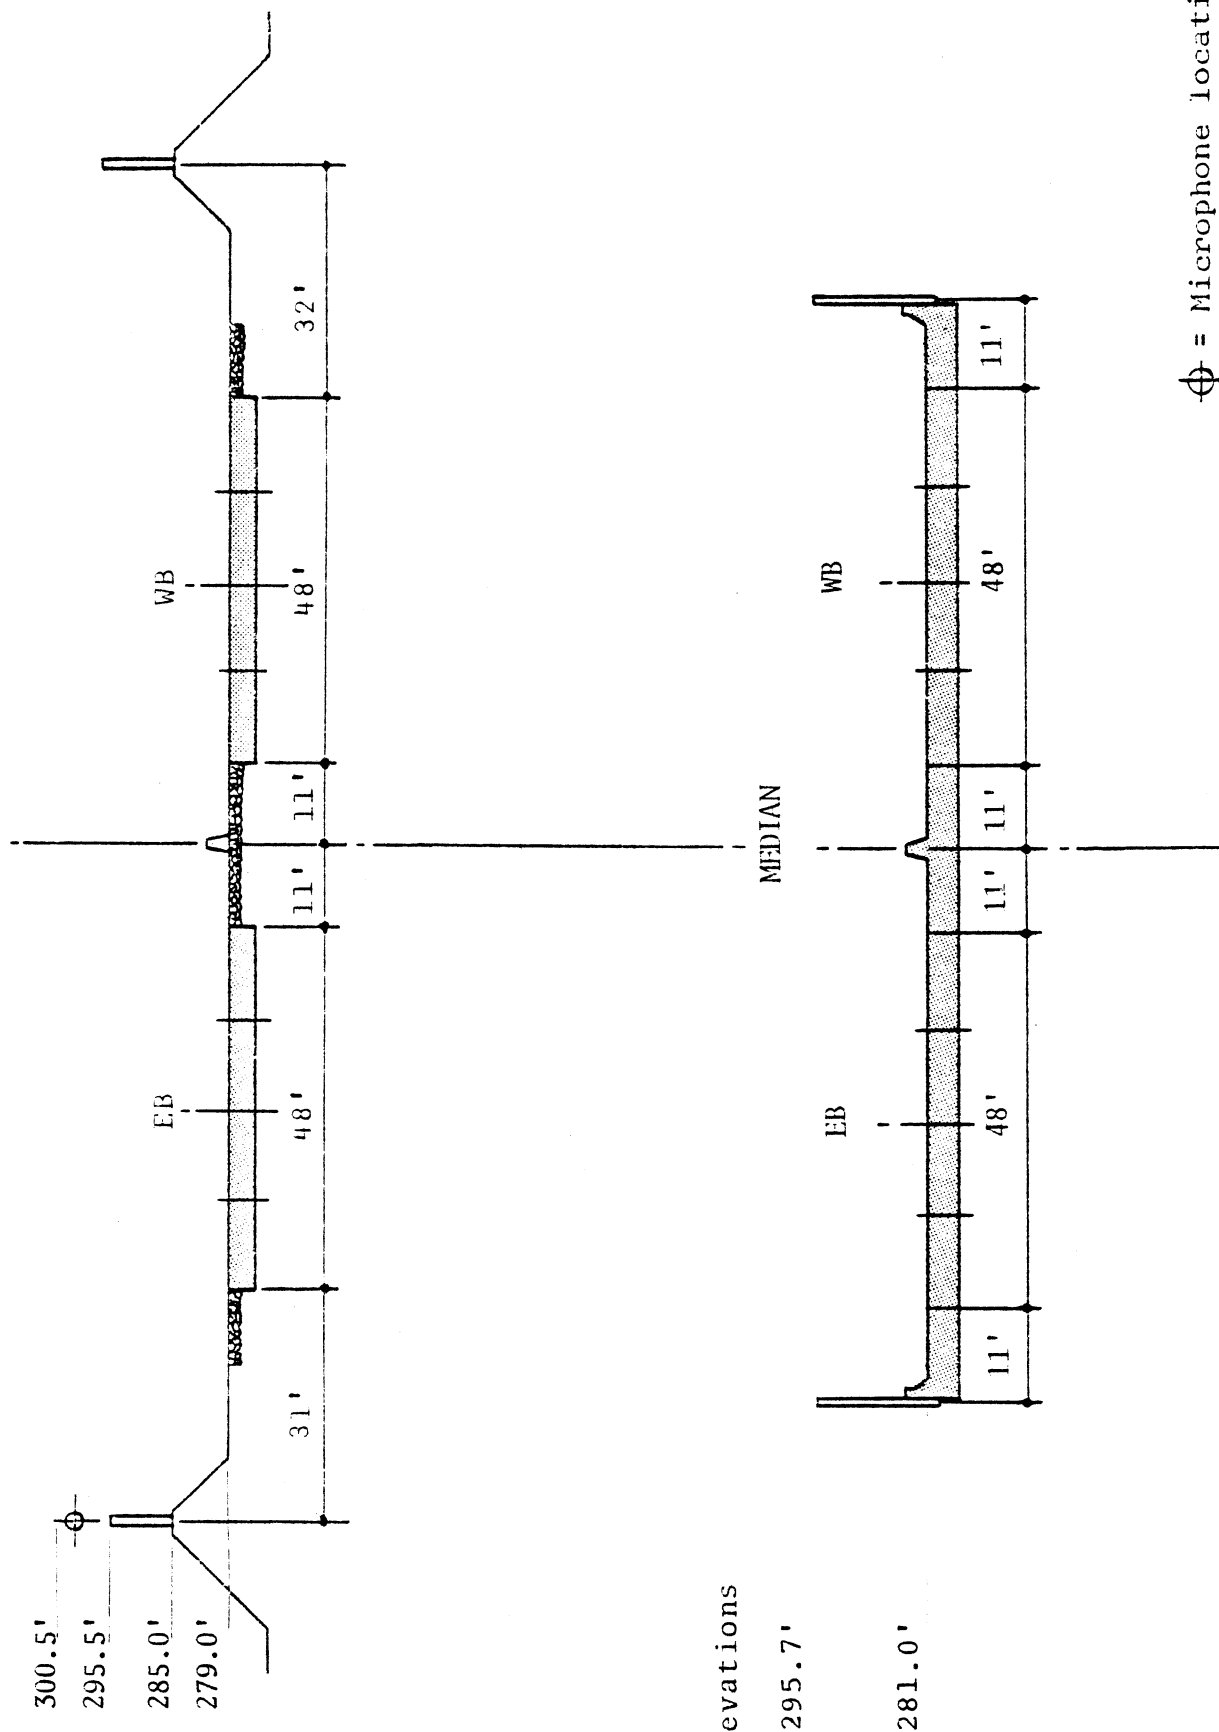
Site 8 in 1979. Roadway section - top, bridge section - bottom.
